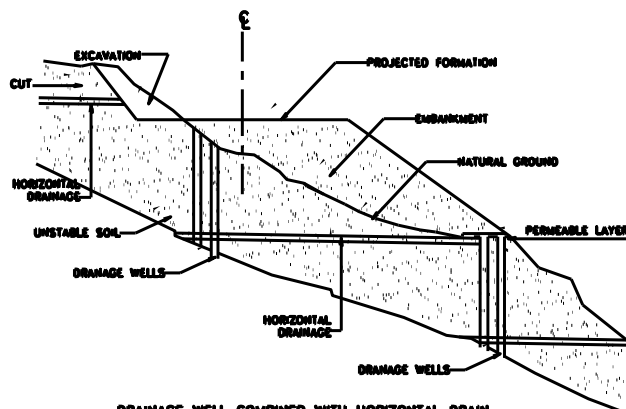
DRAINAGE WELLS AND HORIZONTAL DRAINS
